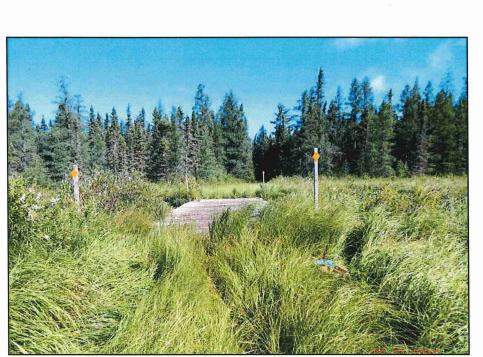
East Two River at Proposed Bridge Crossing Location on East Trail Branch, View Southeast
